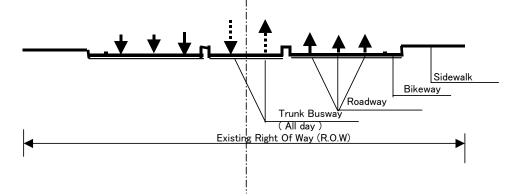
Typical Cross Section Location of Trunk Busway
